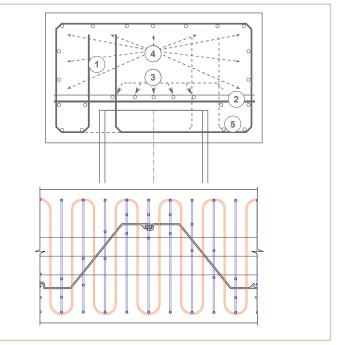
Fixed connection reinforcement detailing (top: cross section; bottom: plan view).
